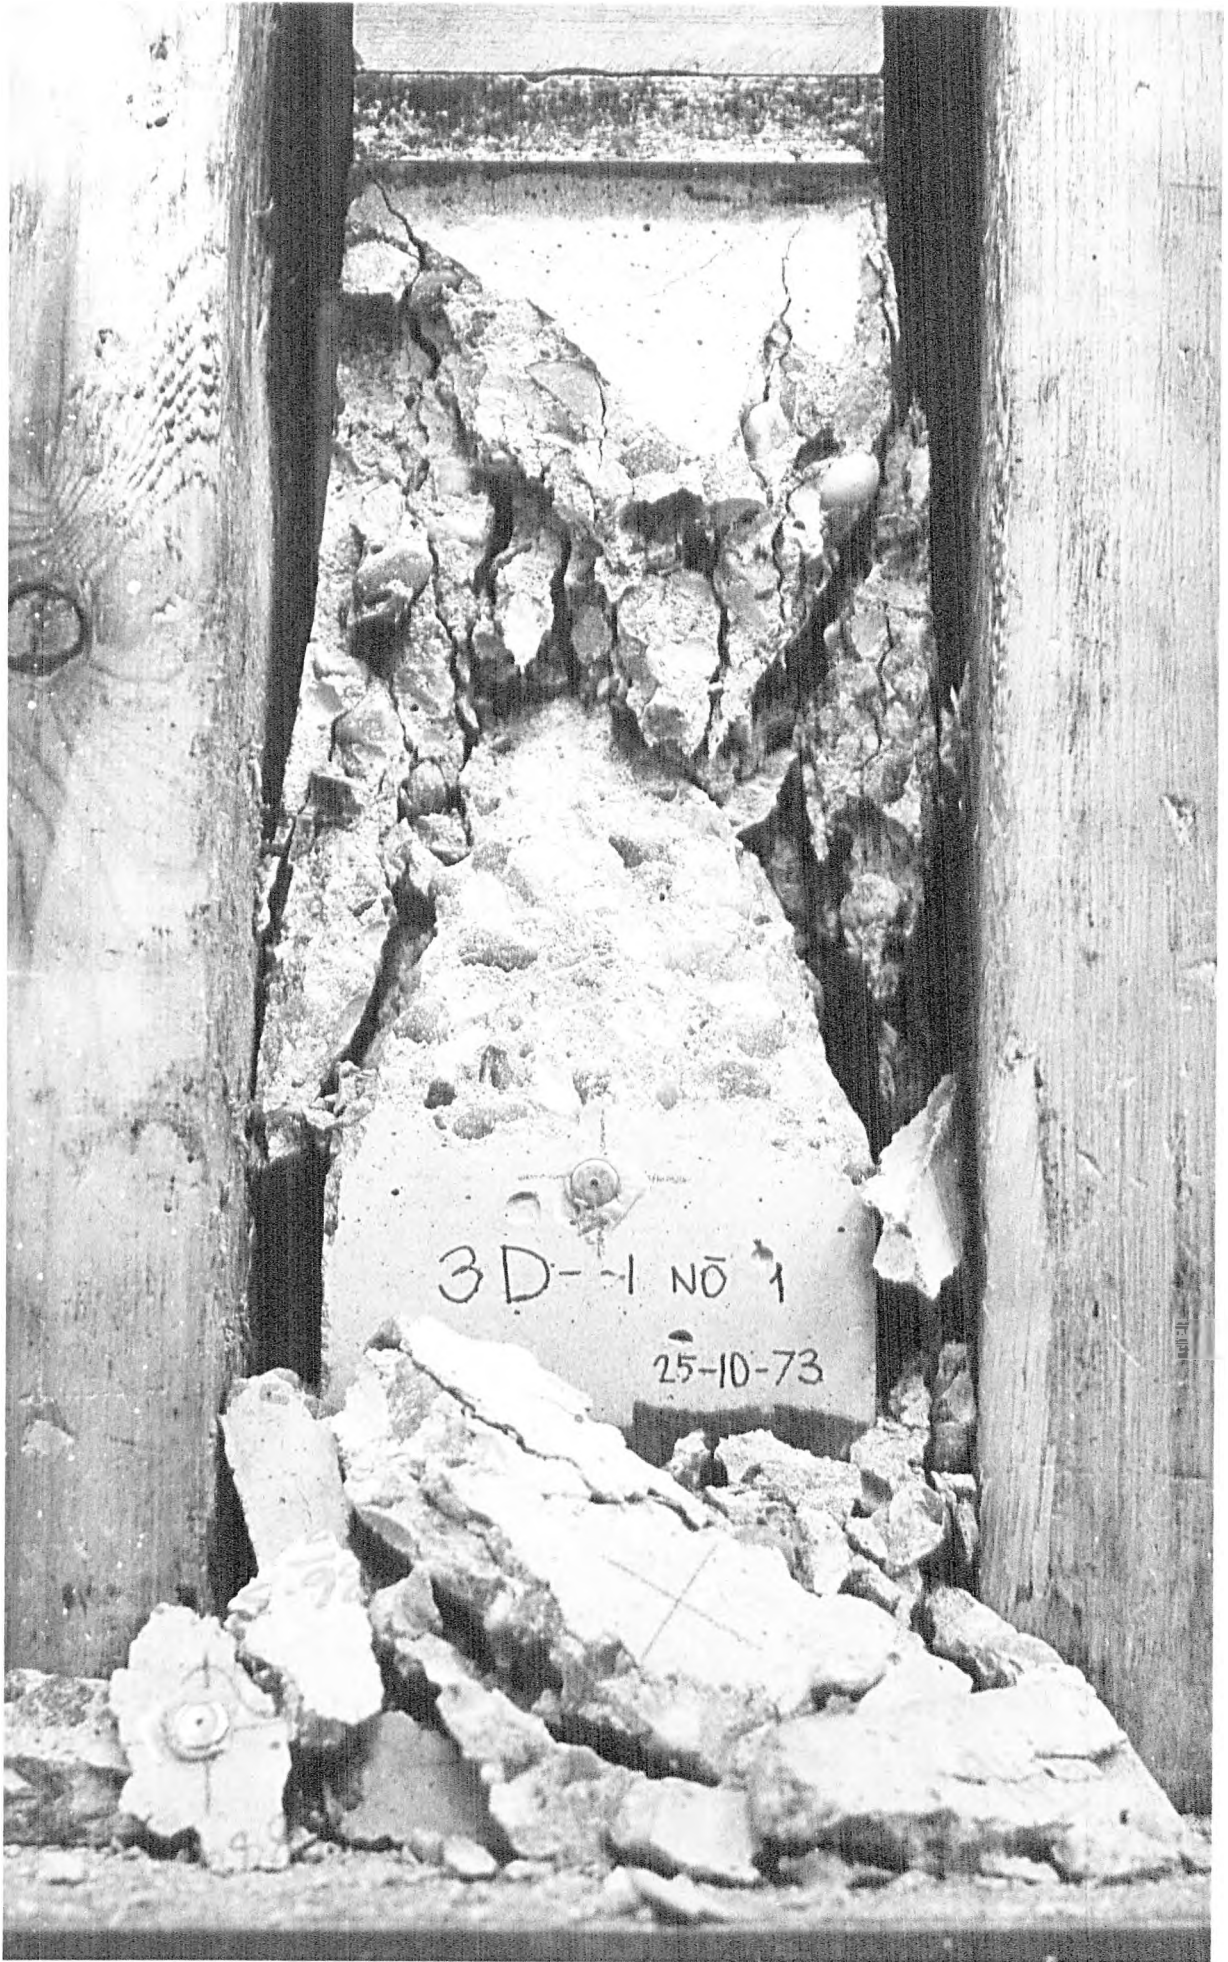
FAILURE MODE IN FATIGUE SPECIMEN.
